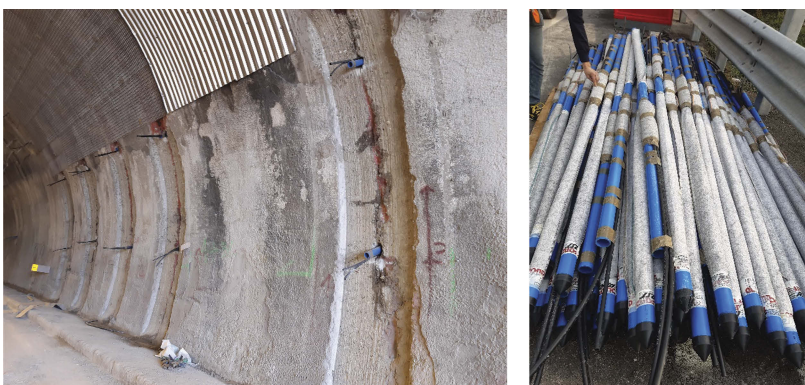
a) Drainage intervention for joint area; b) Detail of fenestrated and blind section of drainage tube.
